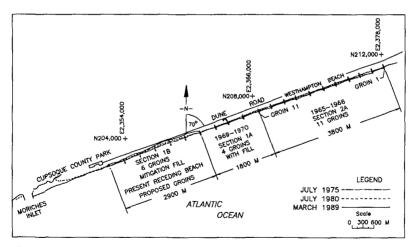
Construction plan for the Westhampton Beach shore-protection project
